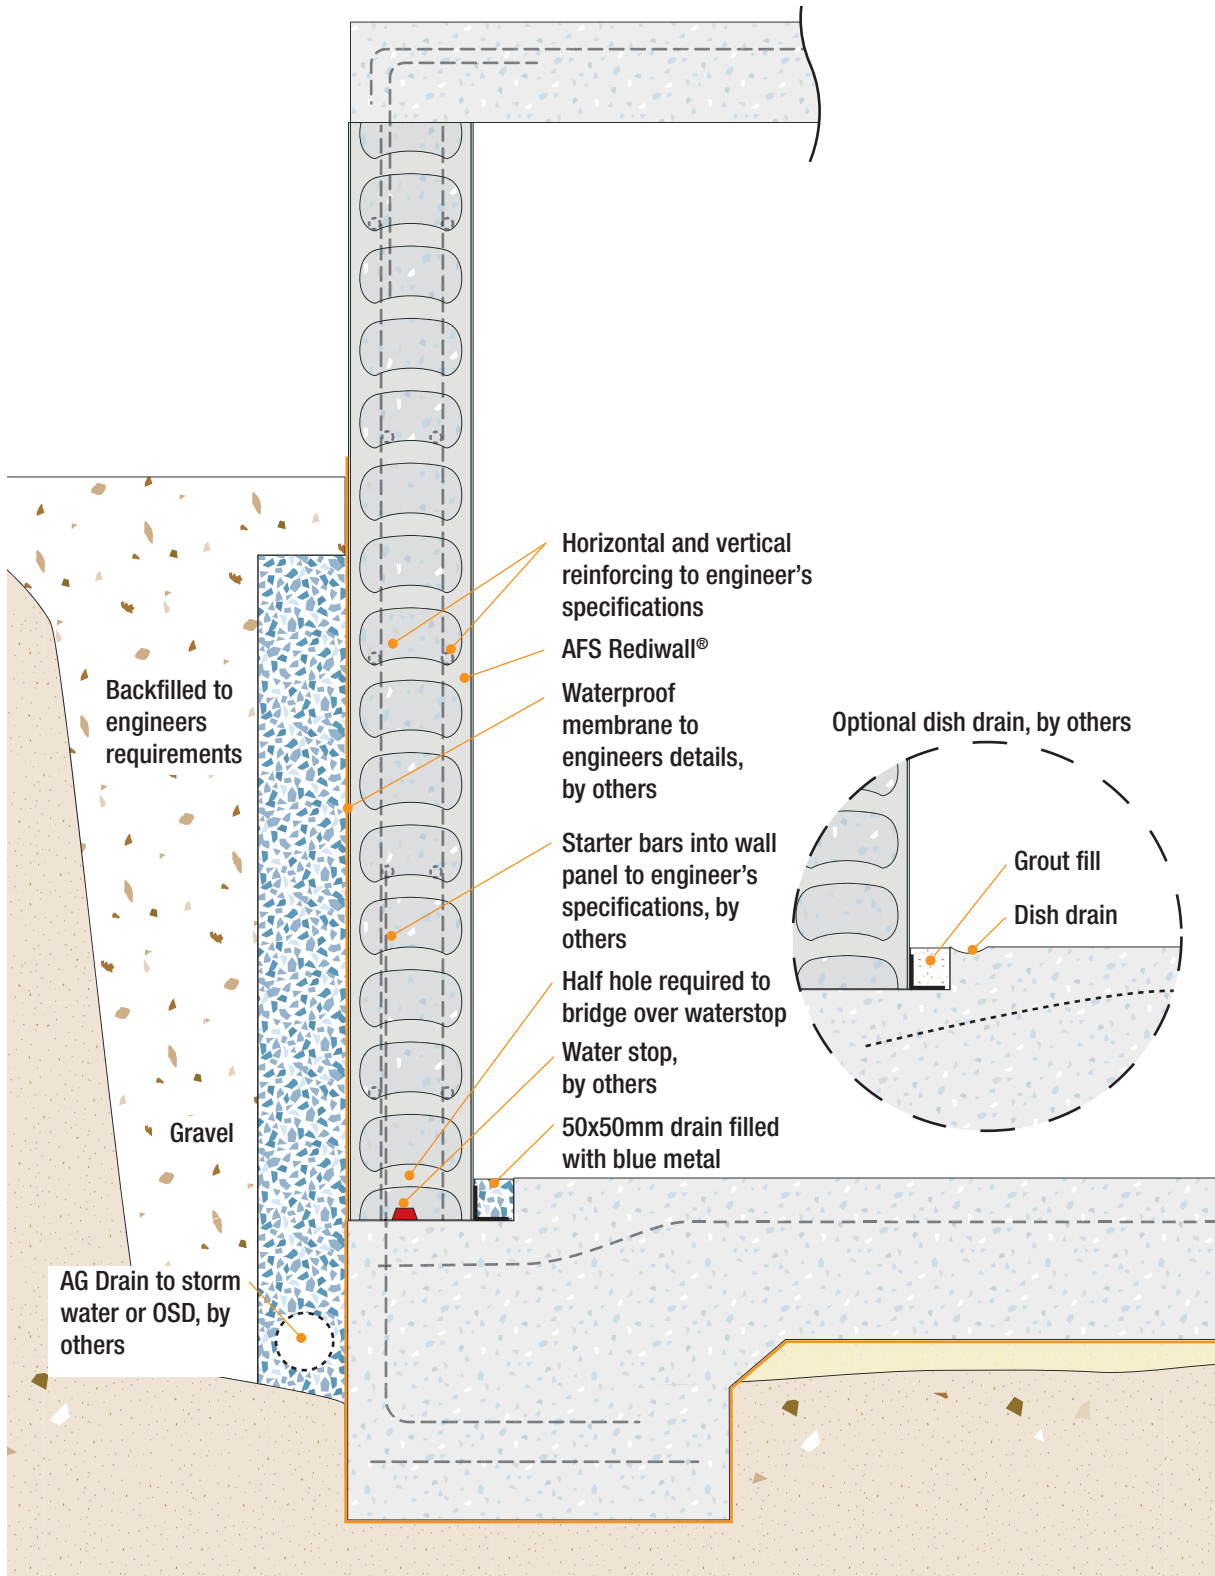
Cantilevered Retaining Wall (maximum height 3400mm)
